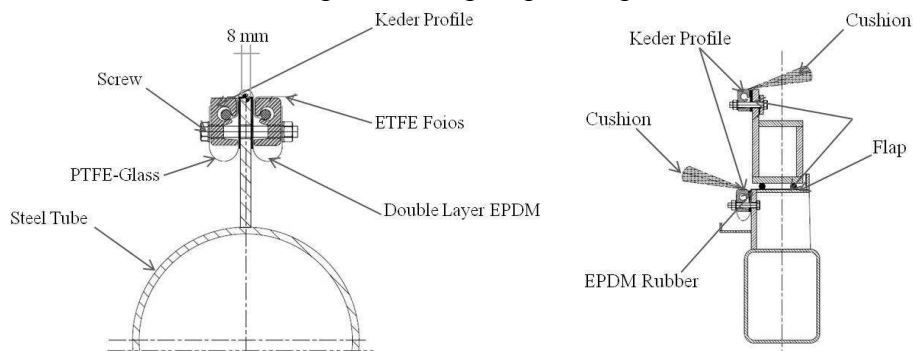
Clamping Profile Detail (Left) and Window Section (right) (Form-TL)
